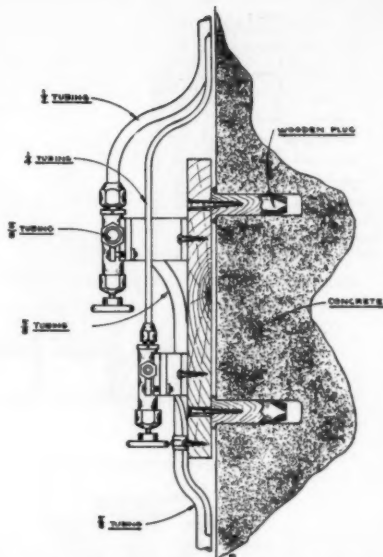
SUGGESTED METHOD OF MOUNTING MANIFOLD BOARD TO CONCRETE WALL
